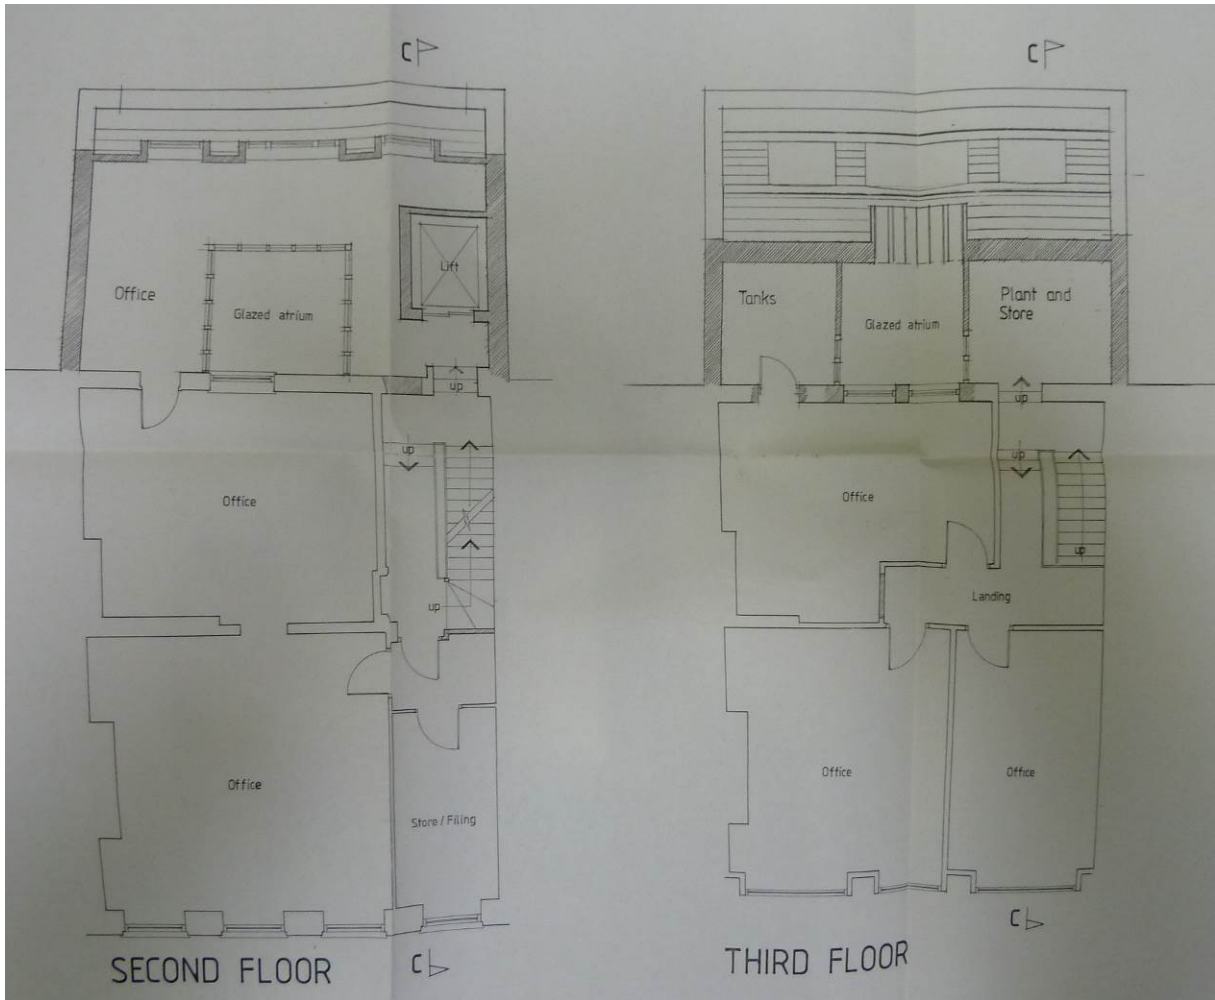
Proposed second and third floor plans, 1990, Gerald Steer (LB Camden, planning file)
